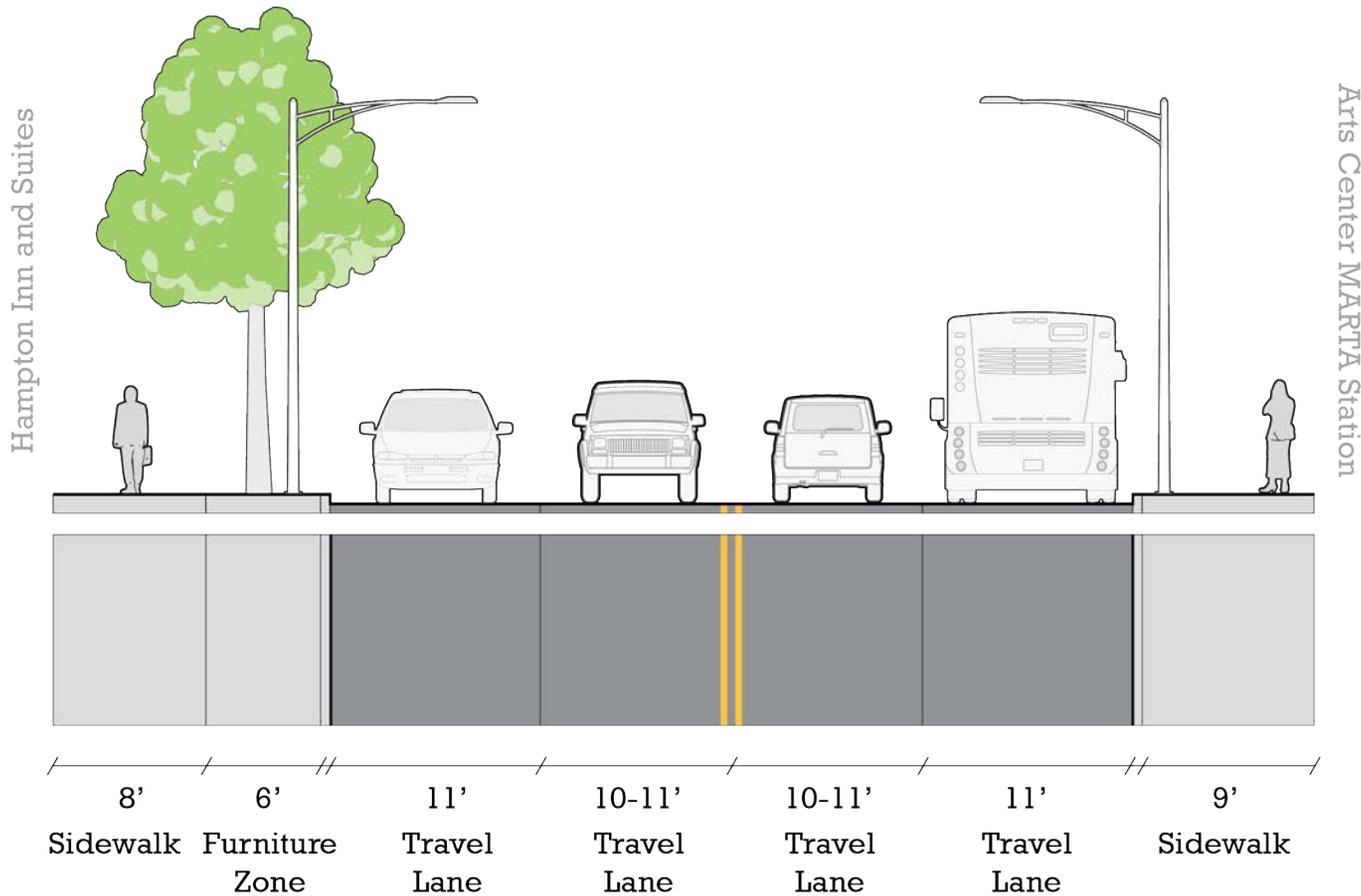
15th Street Typical Section at West Peachtree Street Facing West
